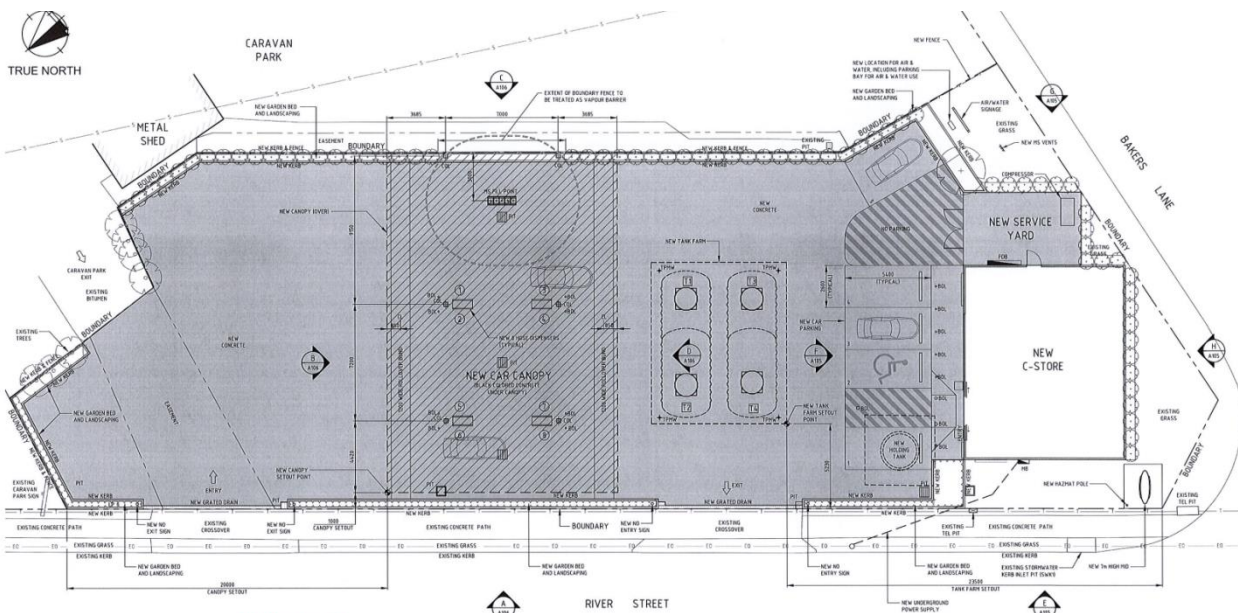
Extract of approved site plan showing proposed service station layout including fuel vent location (top right).
